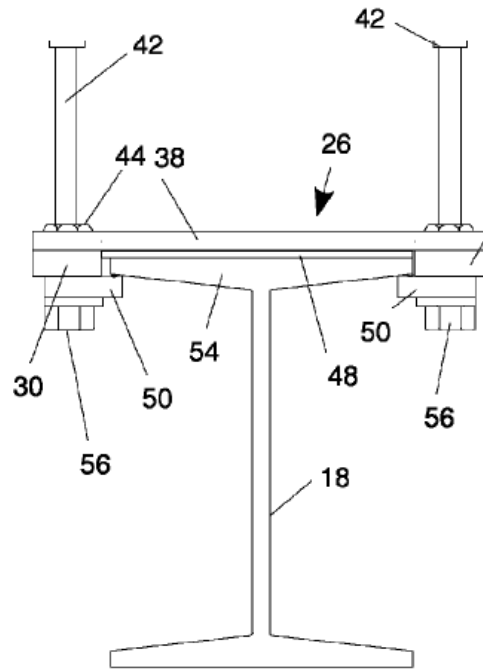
Anchor Plate Assembly on Bridge Beam (Bumen 2012)
